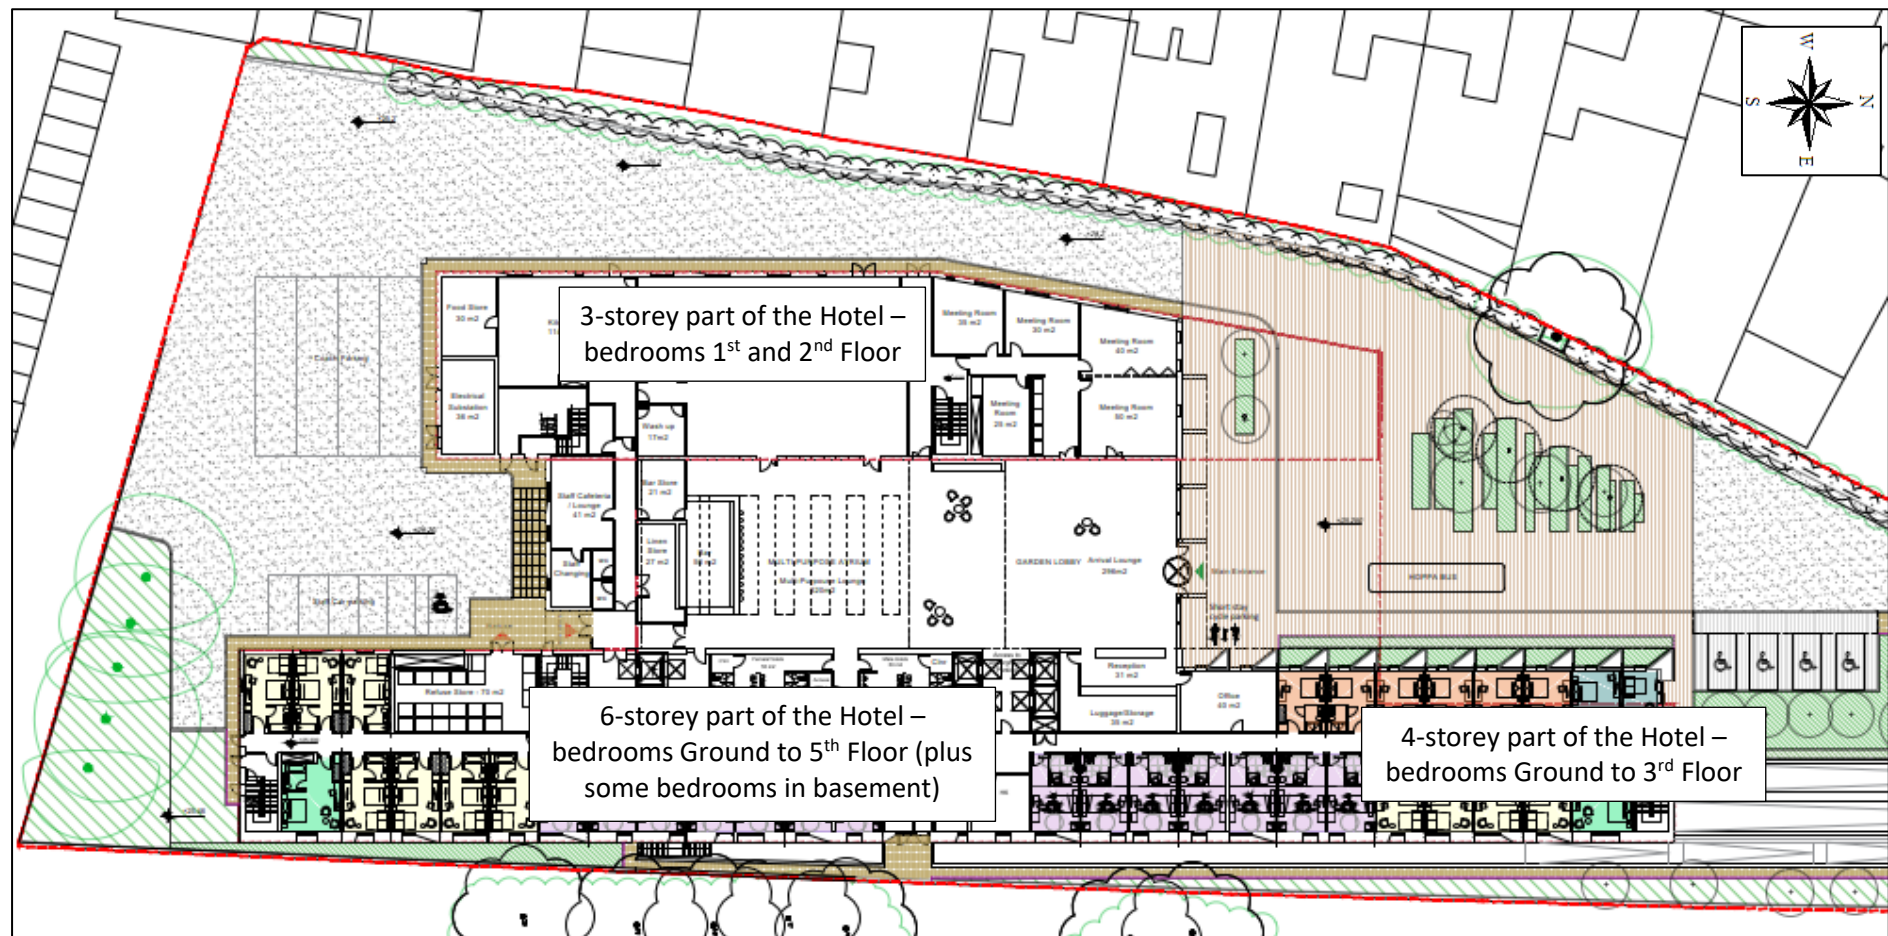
Approved Site Layout Plan (Ground Floor Layout Plant)
